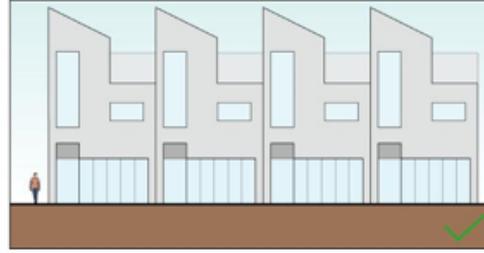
Designing the ground and upper floor uses as an integrated building
